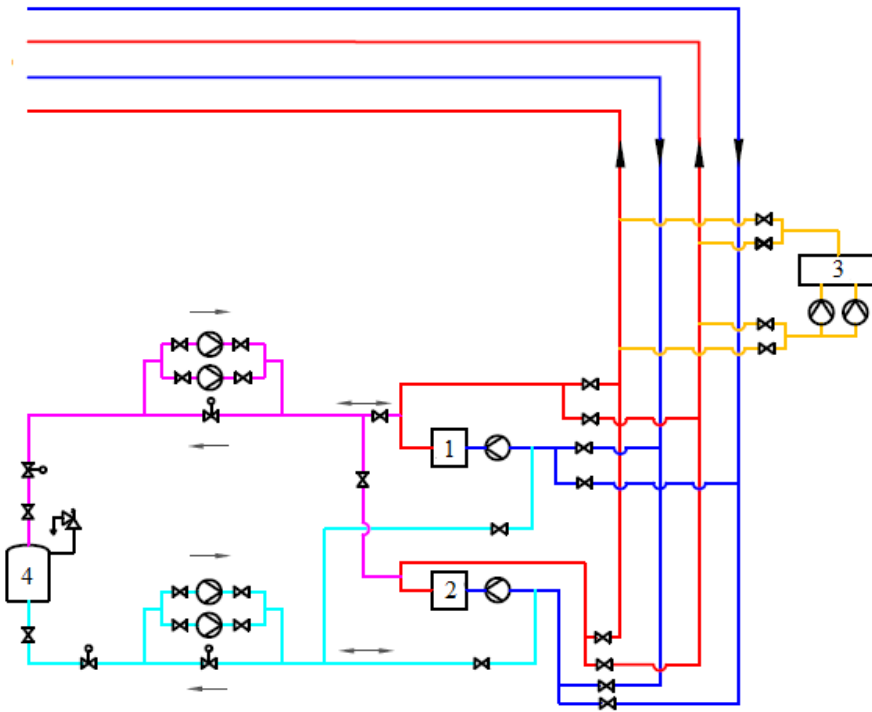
Connection of HFO No. 6 to cogeneration unit pipeline inlets/outlets (1. CHP-2/1; 2. CHP-2/2; 3. Water heating boiler house; 4. HFO tank No. 6).
